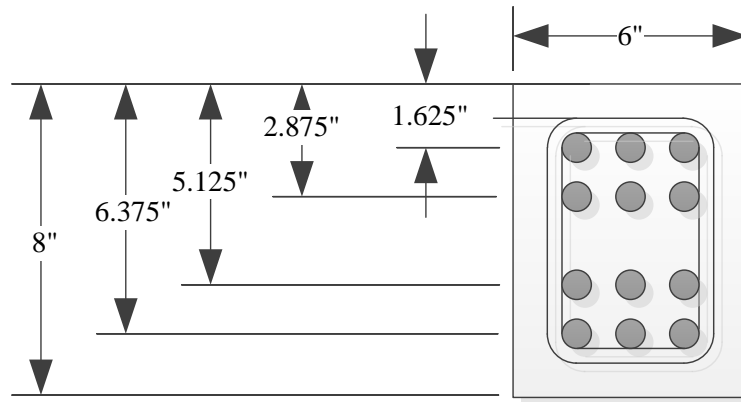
Cross section of GFRP Beam (UHP-FRC #2).
